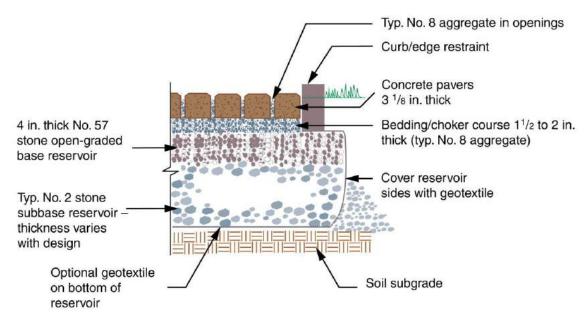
Typical Permeable Interlocking Concrete Pavement
